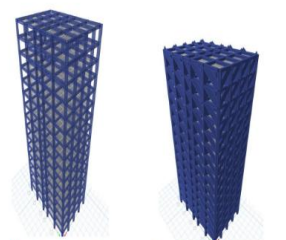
G+15 Building (Bare & Infilled Frame)
